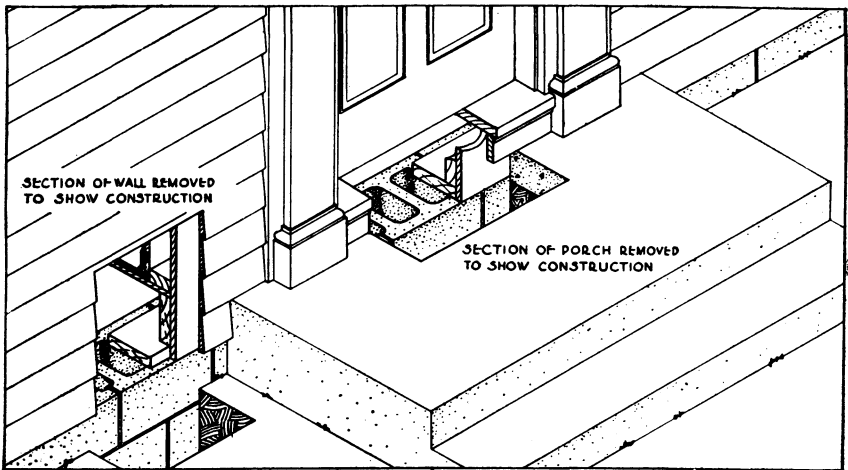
Construction without special protection at porches, steps, and terraces. The absence of special protection is responsible for the great majority of termite infestations. Termites may gain access to the woodwork of a building directly from the fill material or soil beneath such entrance platforms and through voids and settlement or shrinkage cracks in a masonry wall. (See figure 18 for preventive measures.)
